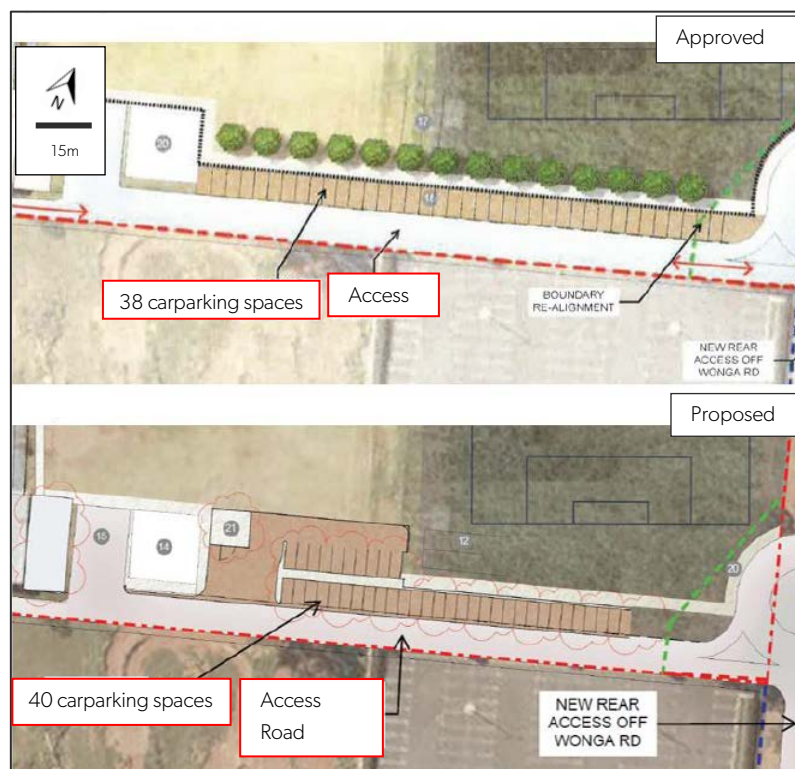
| Reconfiguration of southern car park (source: Section 4.55 Modification Application, 2019)
